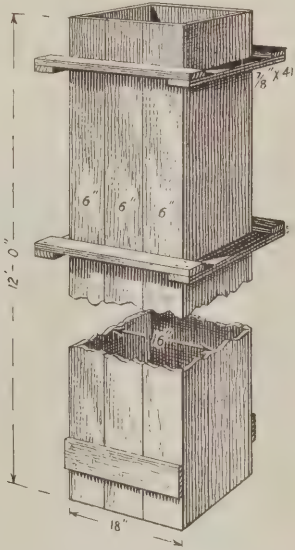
View of Wooden "Form" Used in Concreting a Steel Column.
